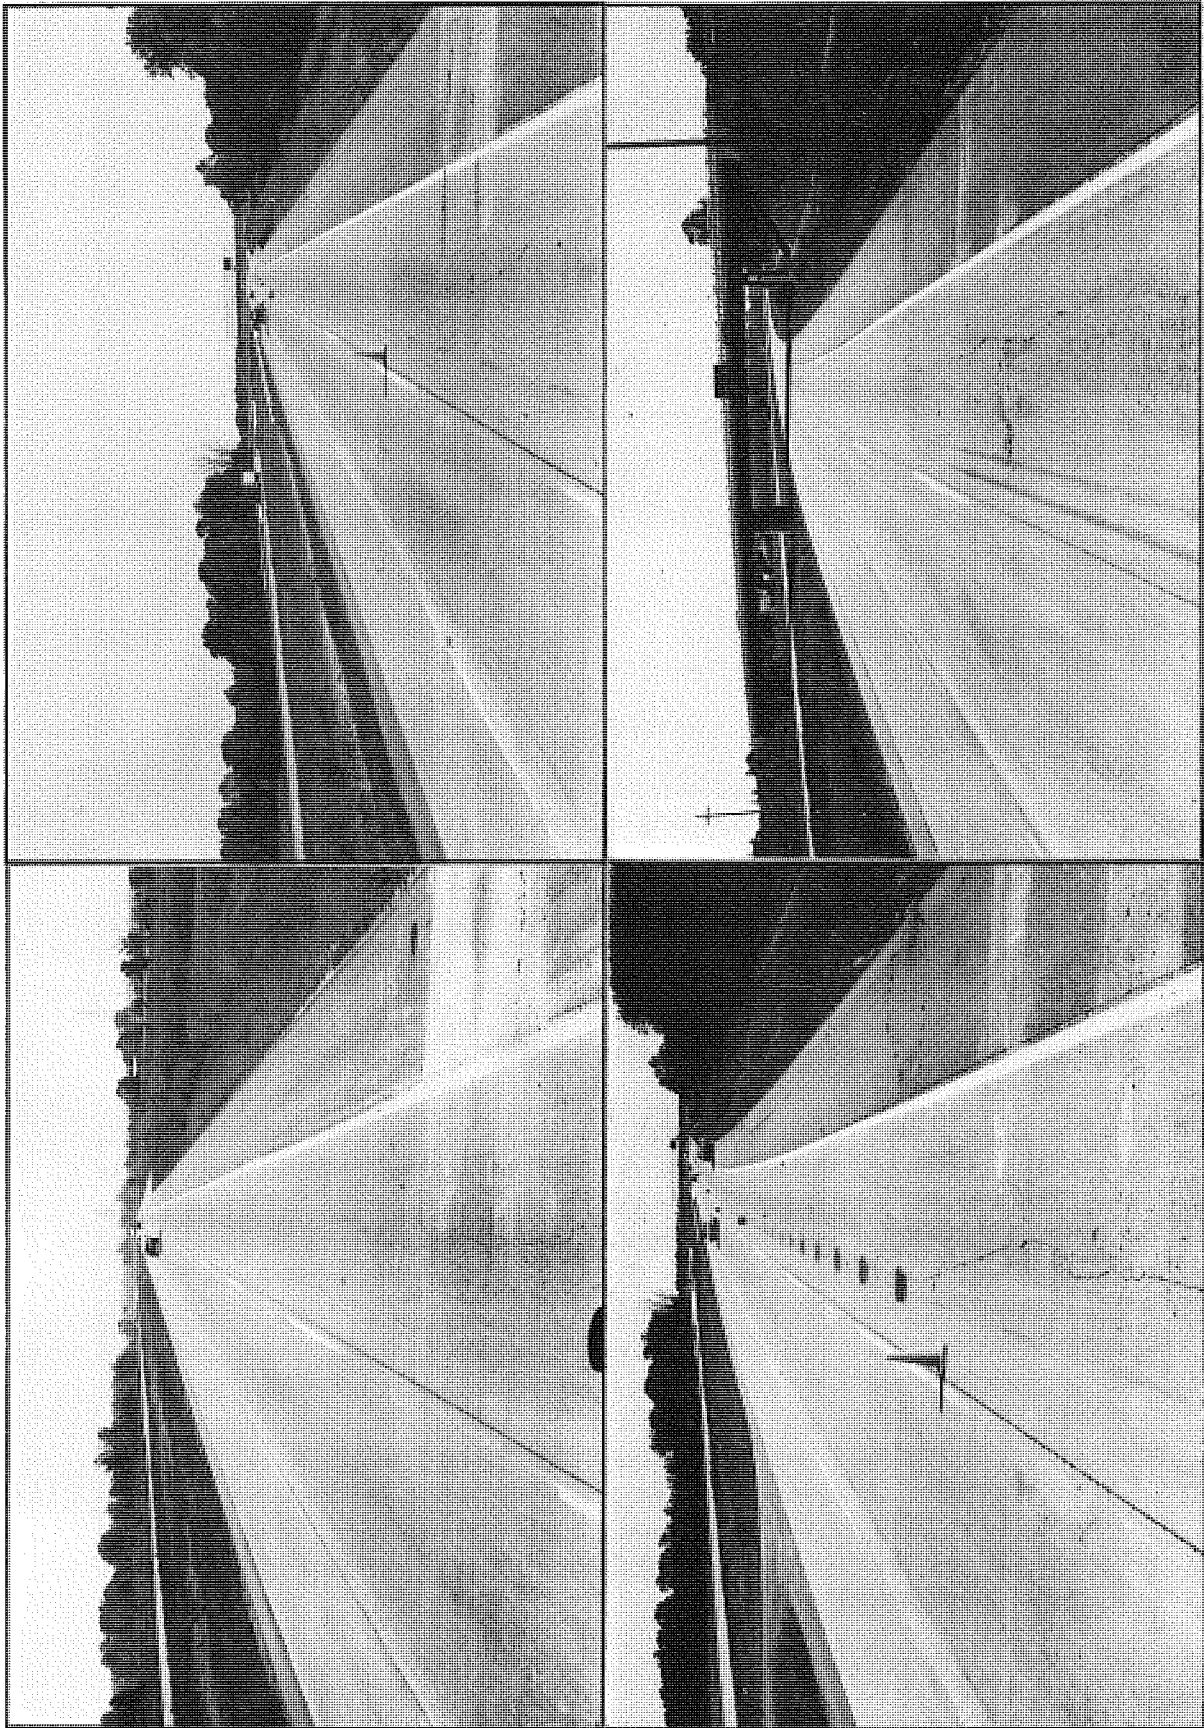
Longitudinal cracking which could be caused by 'frost tenting' action of the base at the longitudinal pavement-shoulder joint.
